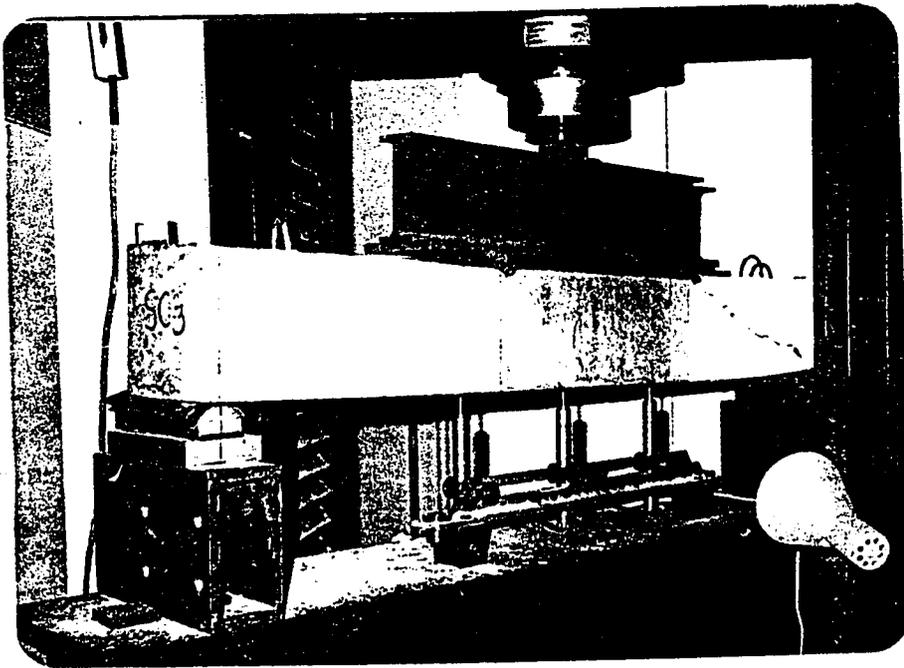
Damaging Shear beams upto the Appearance of the First Crack.
